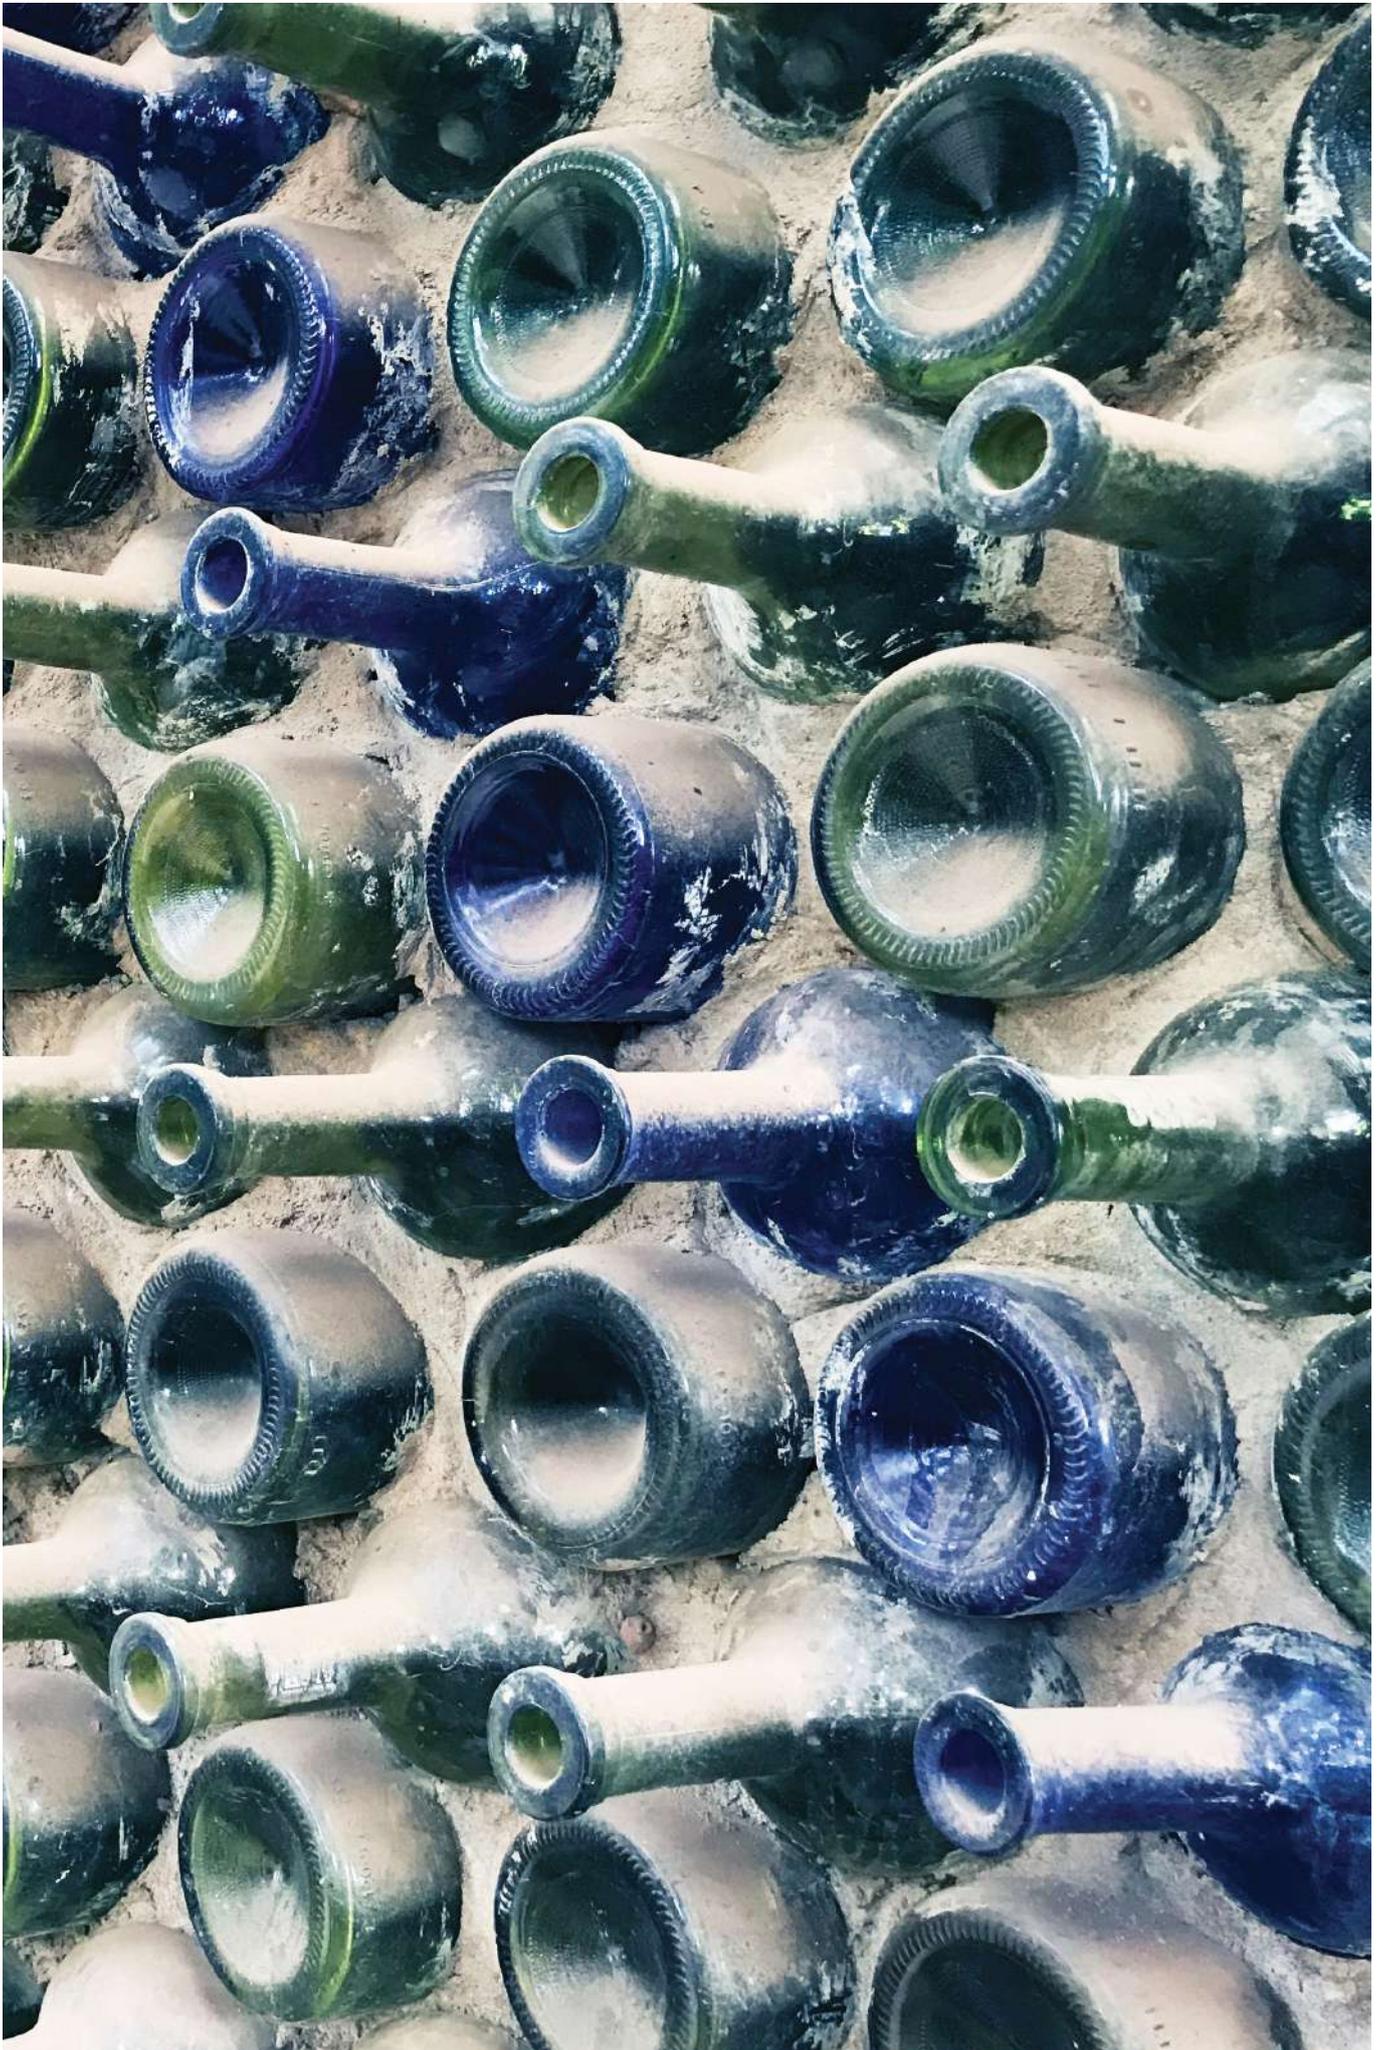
Existing wall built by Abre Crafford (Photograph by Author 2019)
